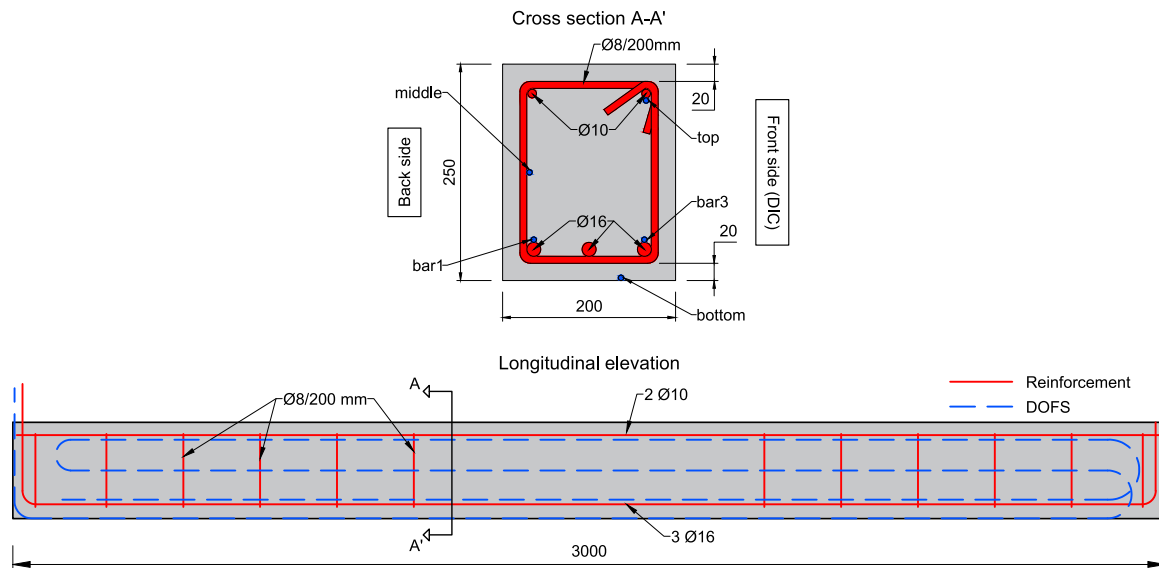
Reinforcement layout, DOFS configuration and geometry of the beam specimen (all measurements in mm).
